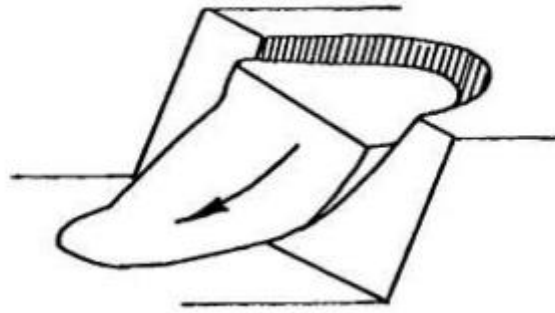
Slope failure under circular failure mode, Evert Hoek and Bray (1981)
